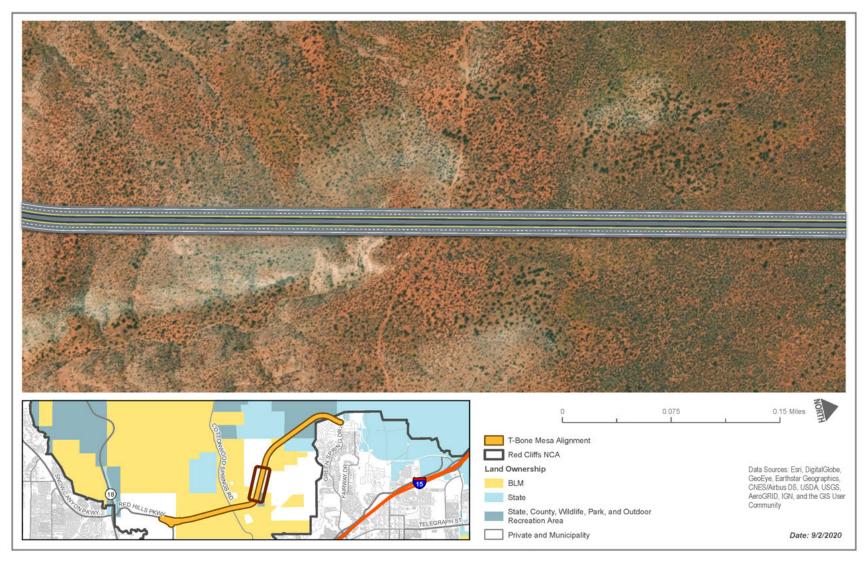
T-Bone Mesa Alignment Plan View (5 of 8)
